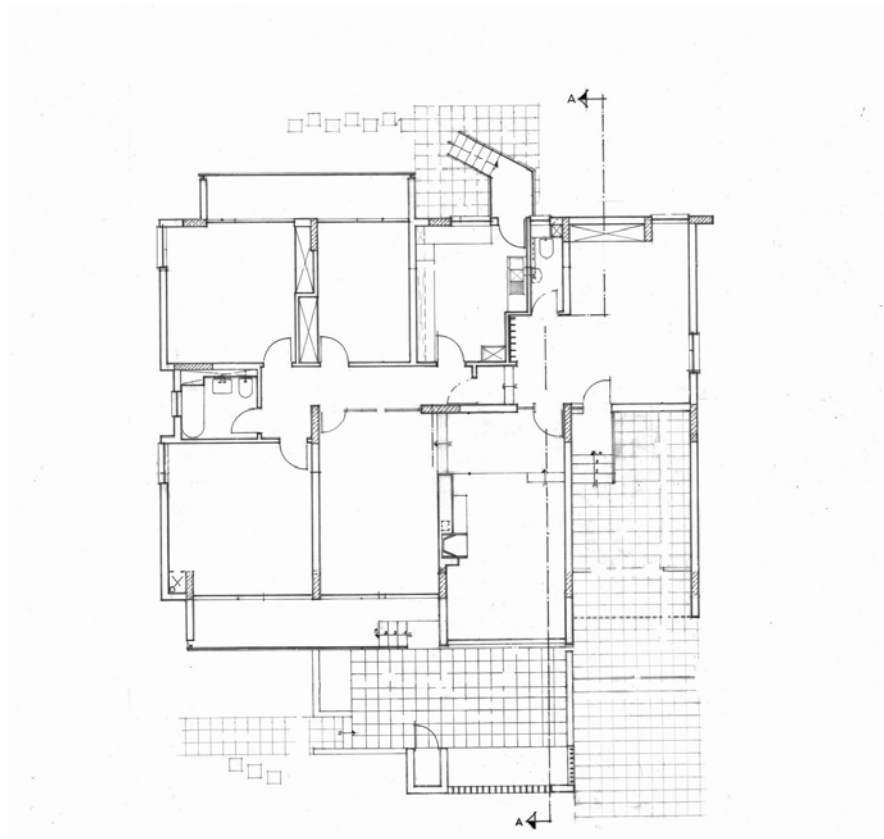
Plan, Adnan Hakki House, Ahmed Behaeddin.
